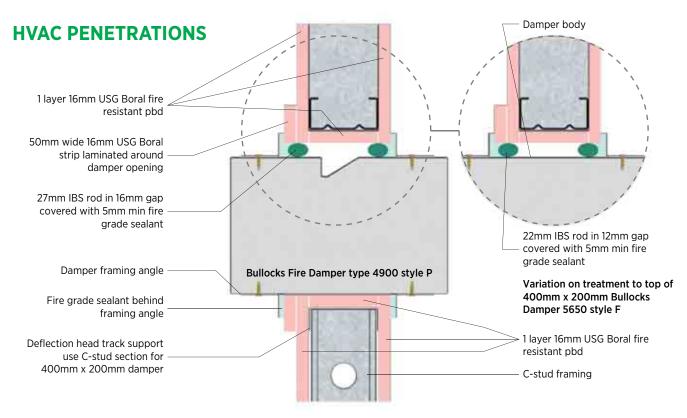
Typical Fire Damper Detail - FRL 60/60/60 Steel Stud Wall
